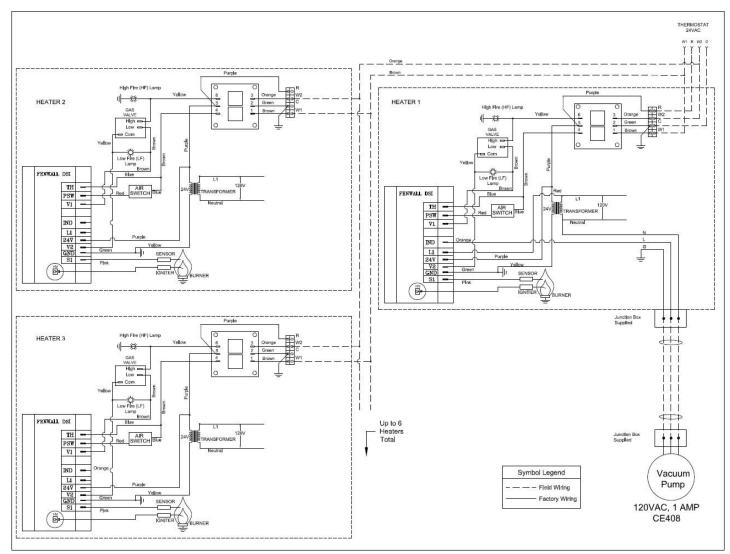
Wiring Diagram – Powering vacuum pump motor (CE408) from the master heater (heater #1)
